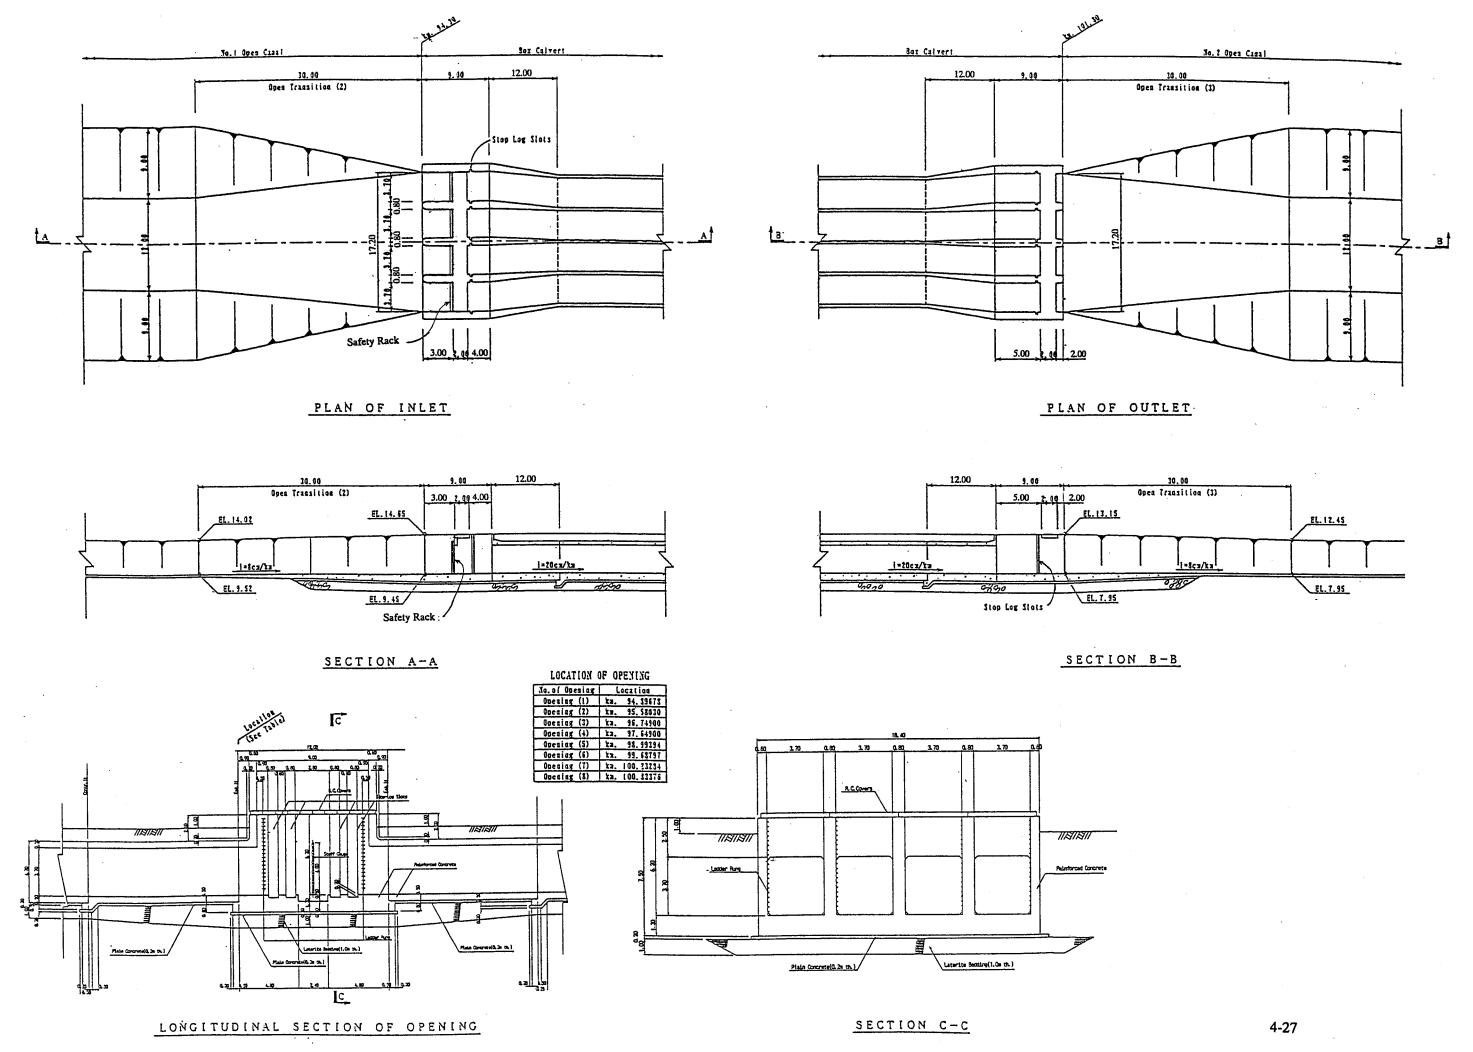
Inlet, Outlet and Openings of Box Culvert
